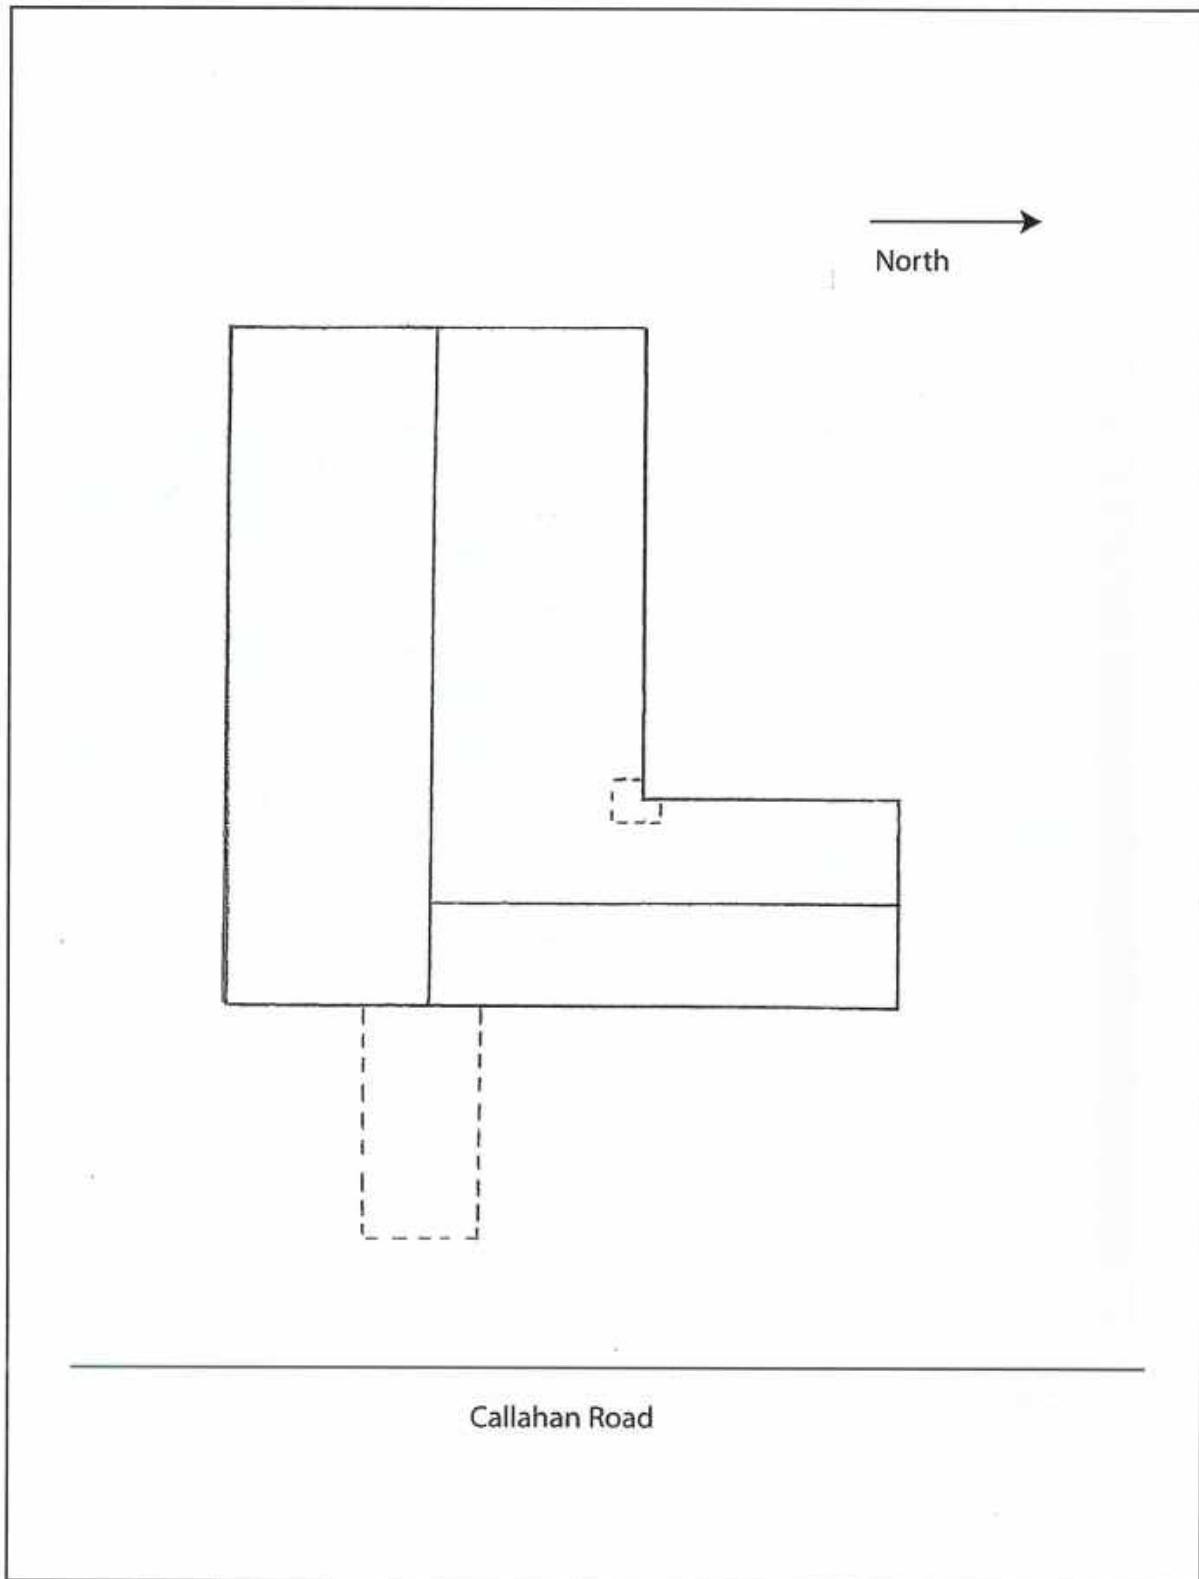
Plan view of the historic Galena Creek Schoolhouse.
